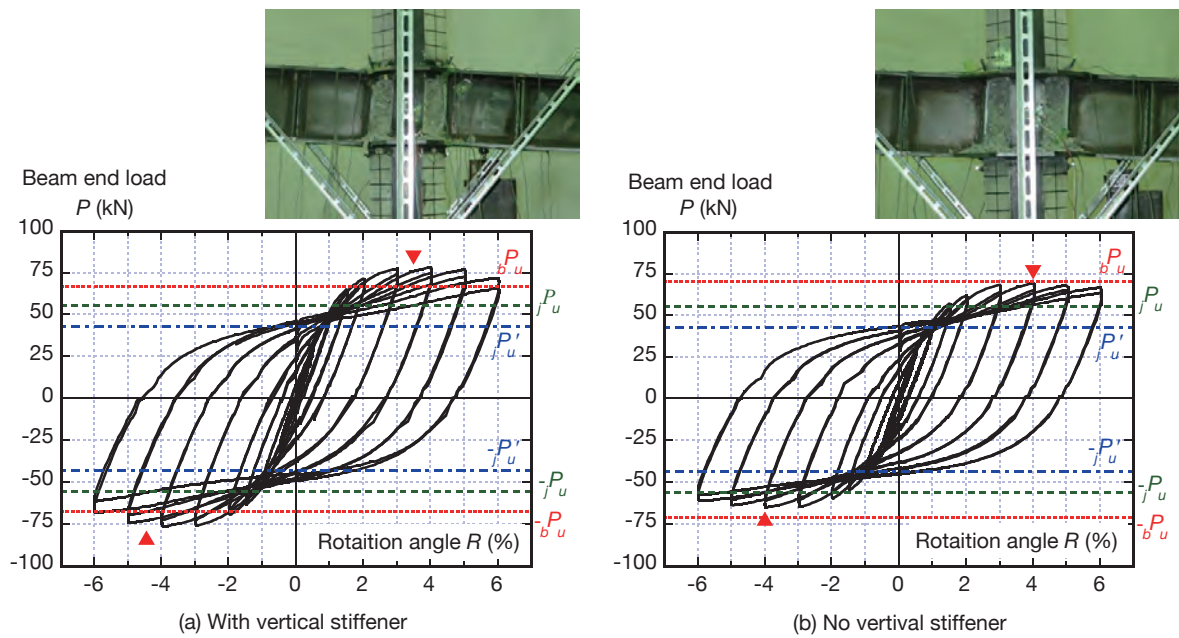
Relationship between Load and Deformation of Column-Beam Connection Composed of Octagonal-section SC Column and Steel-frame Beam⁶⁾
